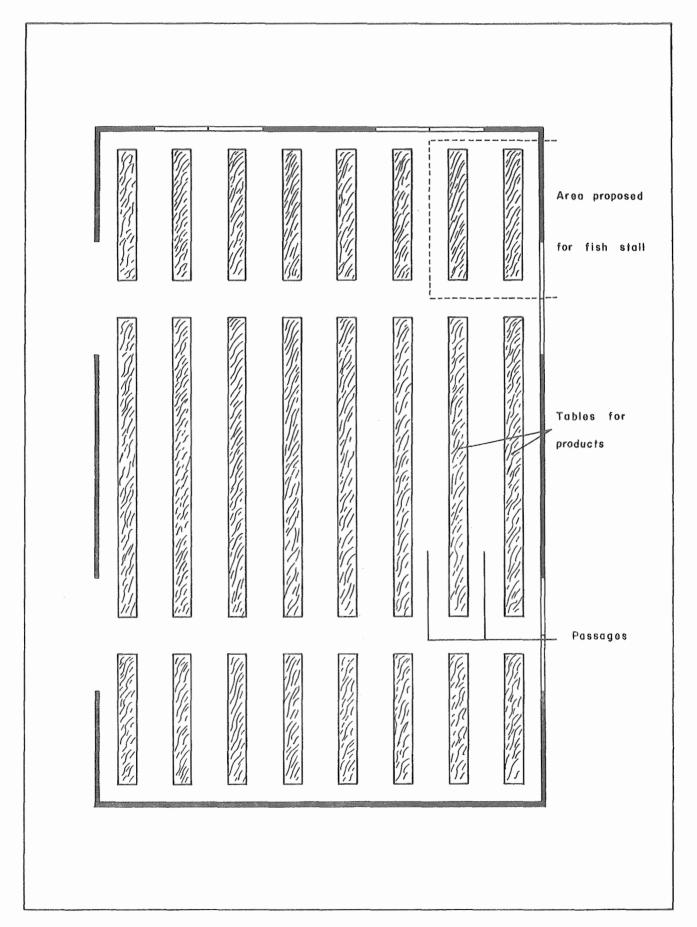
PLAN OF BUILDING B SHOWING POSITION OF STALLS
